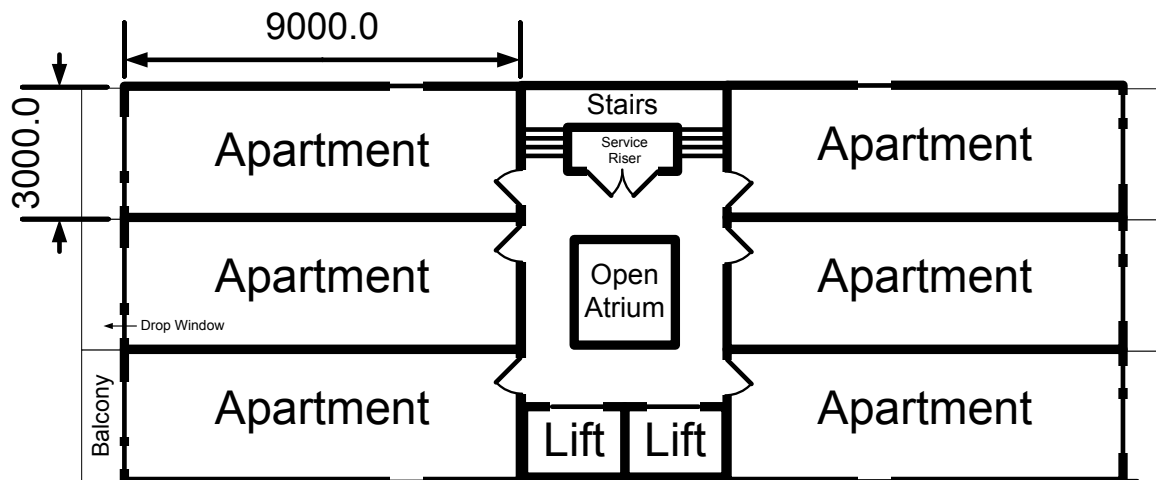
Typical level plan view of scenario 1 proposed building (from DBH determination 2005-109^[6]).
